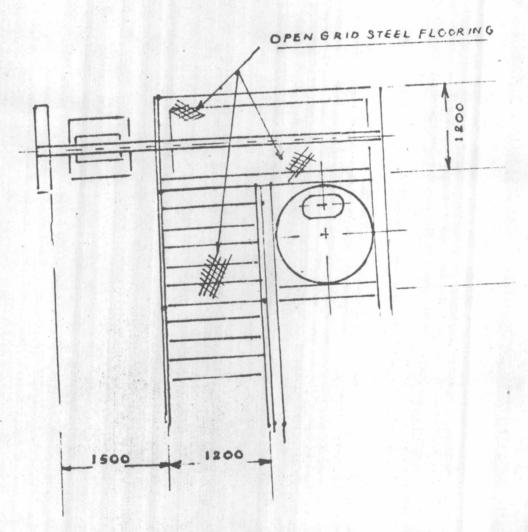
Plan view of stillage and hoist for 250 tank
